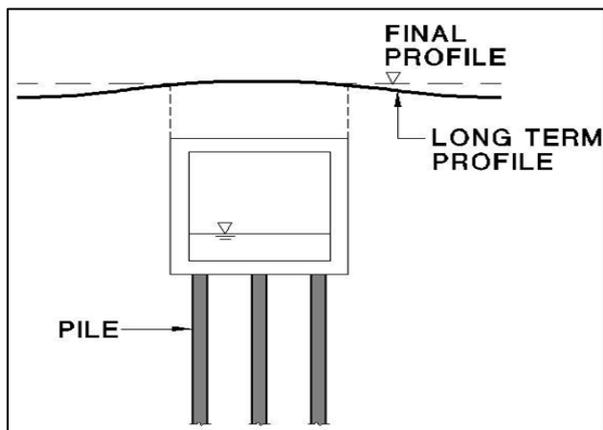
Culvert Founded on Pile Foundation (not recommended)
